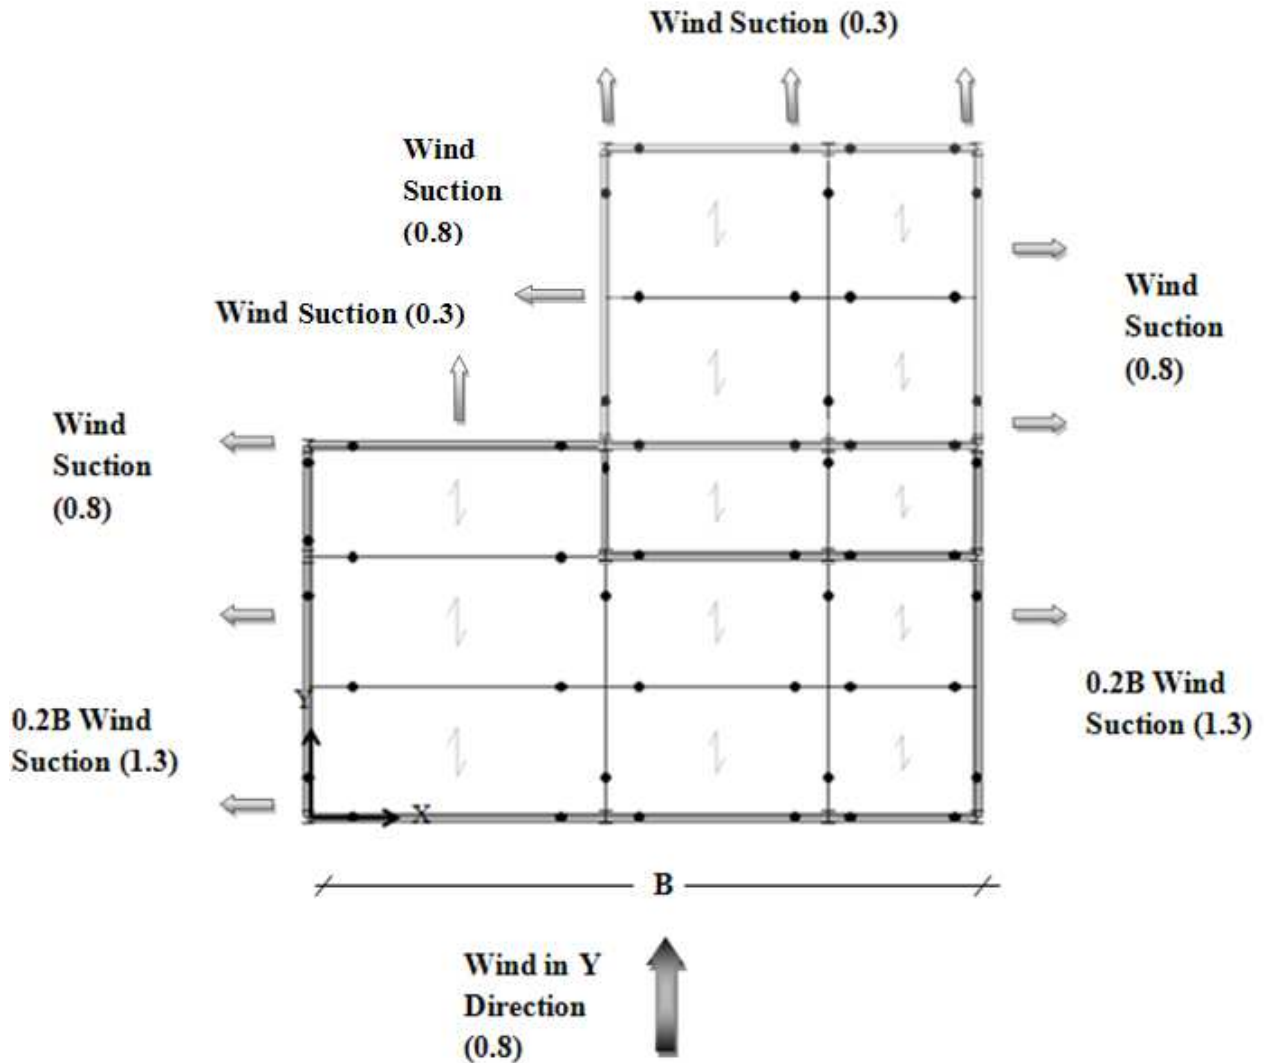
(b): Building layout indicating wind in Y direction with suctions for asymmetrical plan and section.
